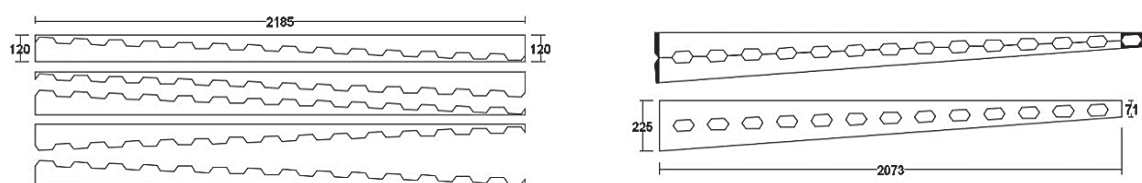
Creating non-prismatic castellated beam section sample from regular steel beam
